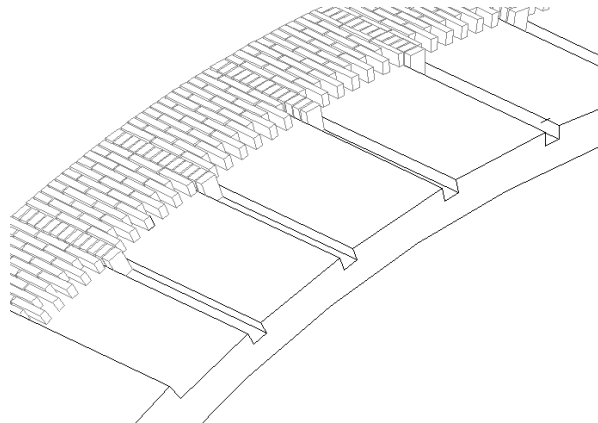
Scheme for thickening existing masonry arch. (Modena, 2004)
